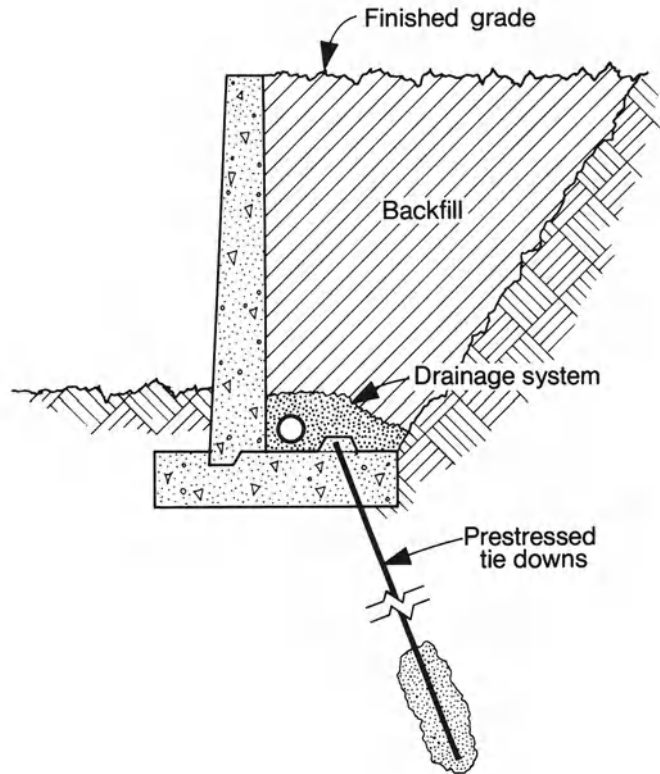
Retaining walls with prestressed tie-downs.
